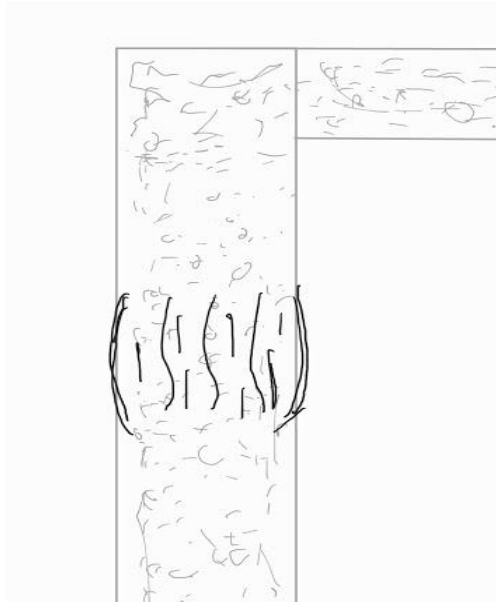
Show cracks in a compact concrete column armed with normal reinforcement , and helical reinforcement
